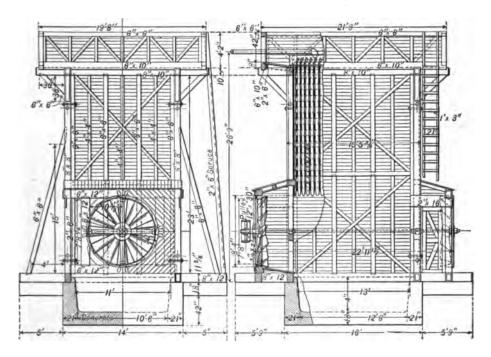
FAN DRAFT TOWER-WOOD CONSTRUCTION.
